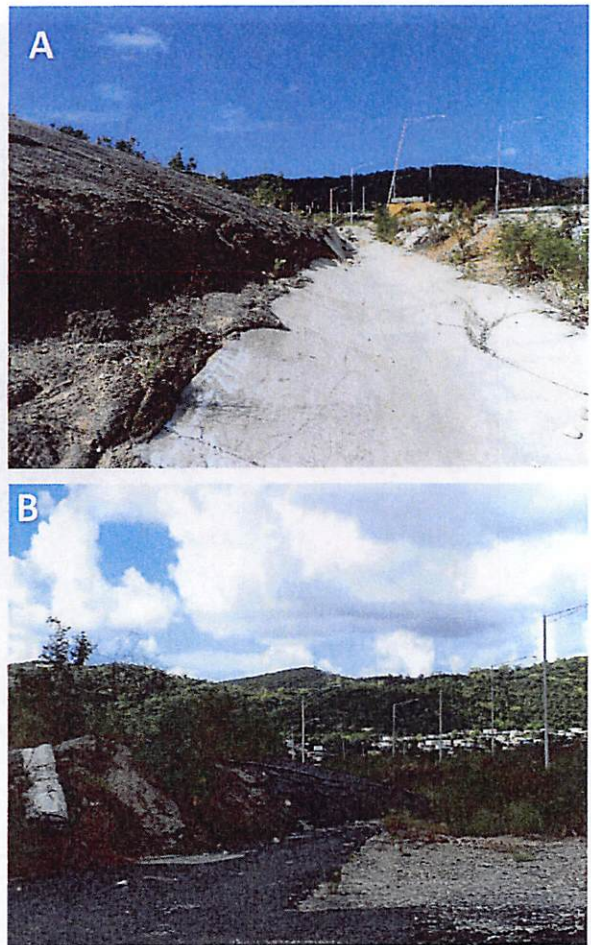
Slope failure PR-9 Ponce. (Stop #3)
